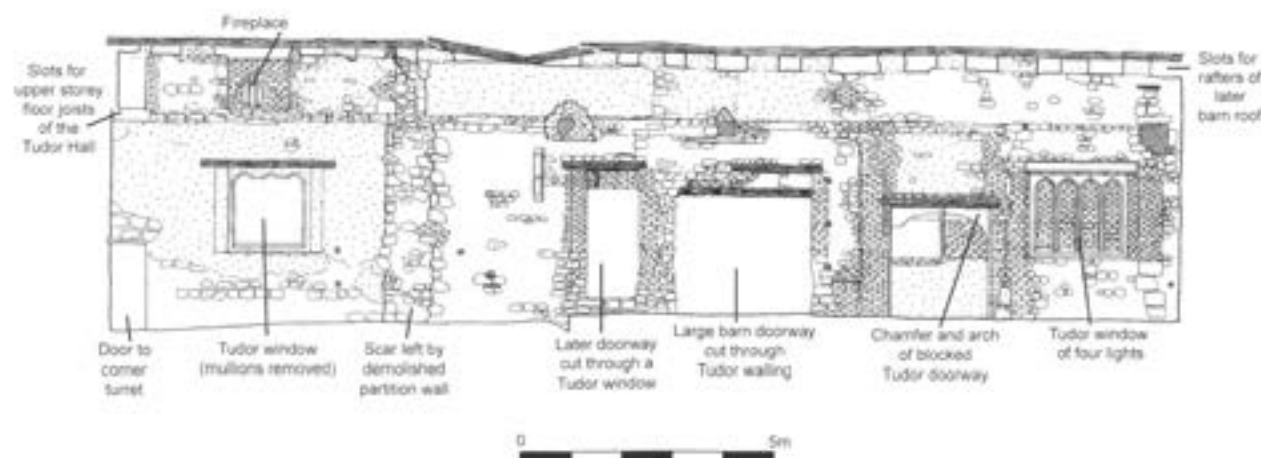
Rochford Hall, elevation of the interior of the north wall of the north range, from a complete survey of the Barns made in 1985.
